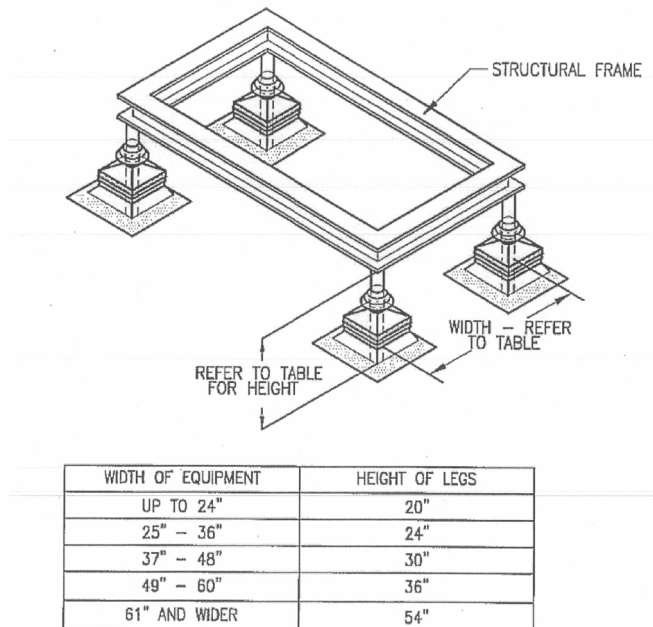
ELEVATED MECHANICAL PLATFORM SUPPORT STRUCTURE FOR INSTALLATIONS ABOVE ROOF
